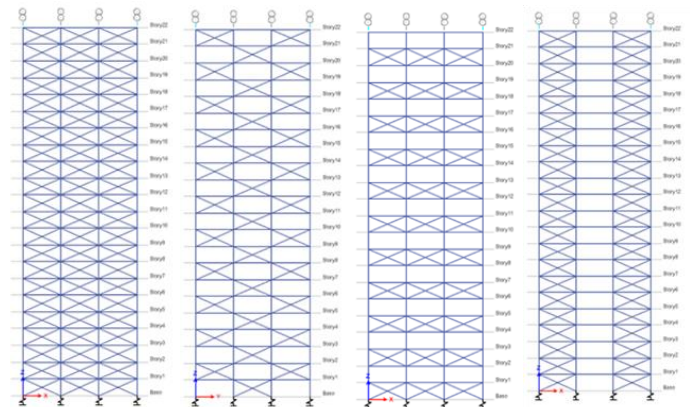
ELEVATION OF 22 STOREY DIAGRID BUILDINGS WITH X BRACING PATTERN ARRANGEMENT ((A) WHOLE, (B) ALTERNATE, (C) HORIZONTAL, (D) VERTICAL)
